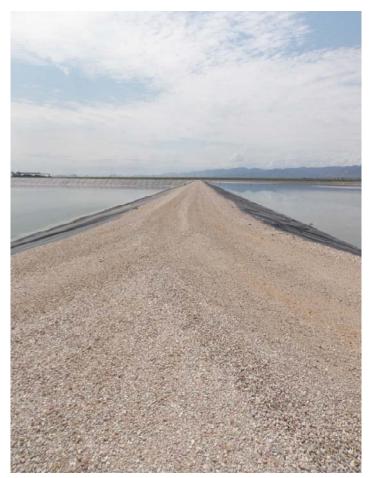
Crest between Ash Pond 3 and Evaporation Pond, looking south.
